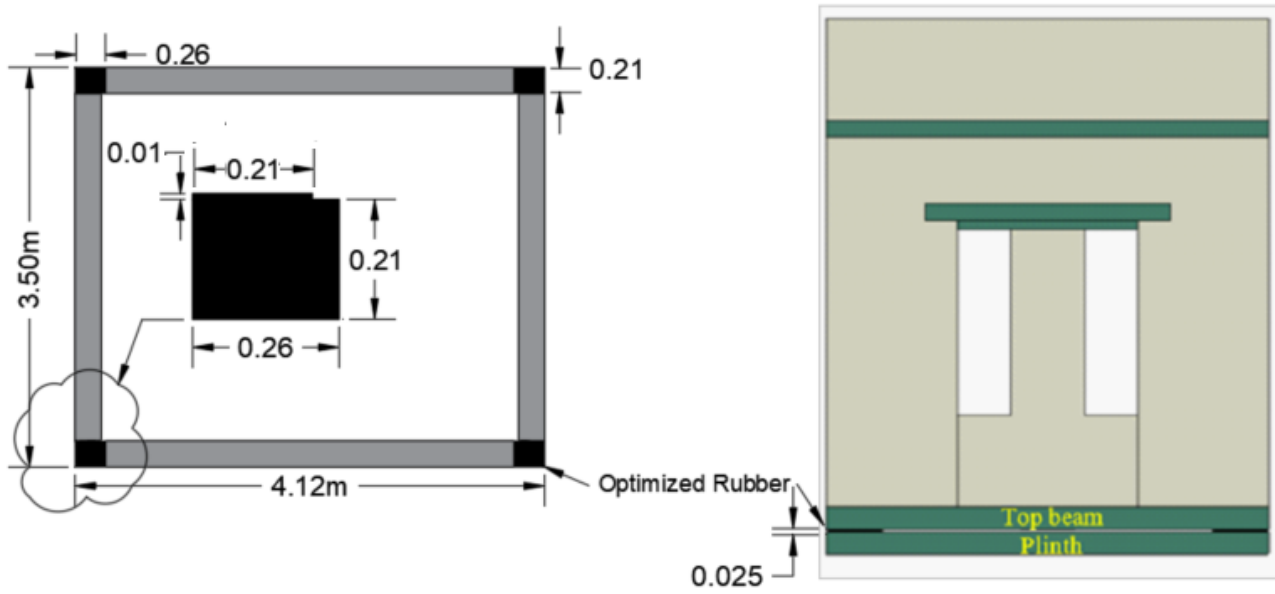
Plan and elevation of building model with beams and optimized rubber (all dimensions are in m)
